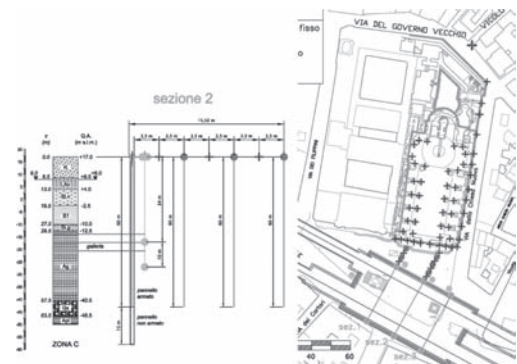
Proposed layout of instrumentation at Chiesa Nuova Station (courtesy of Metro C spa).
